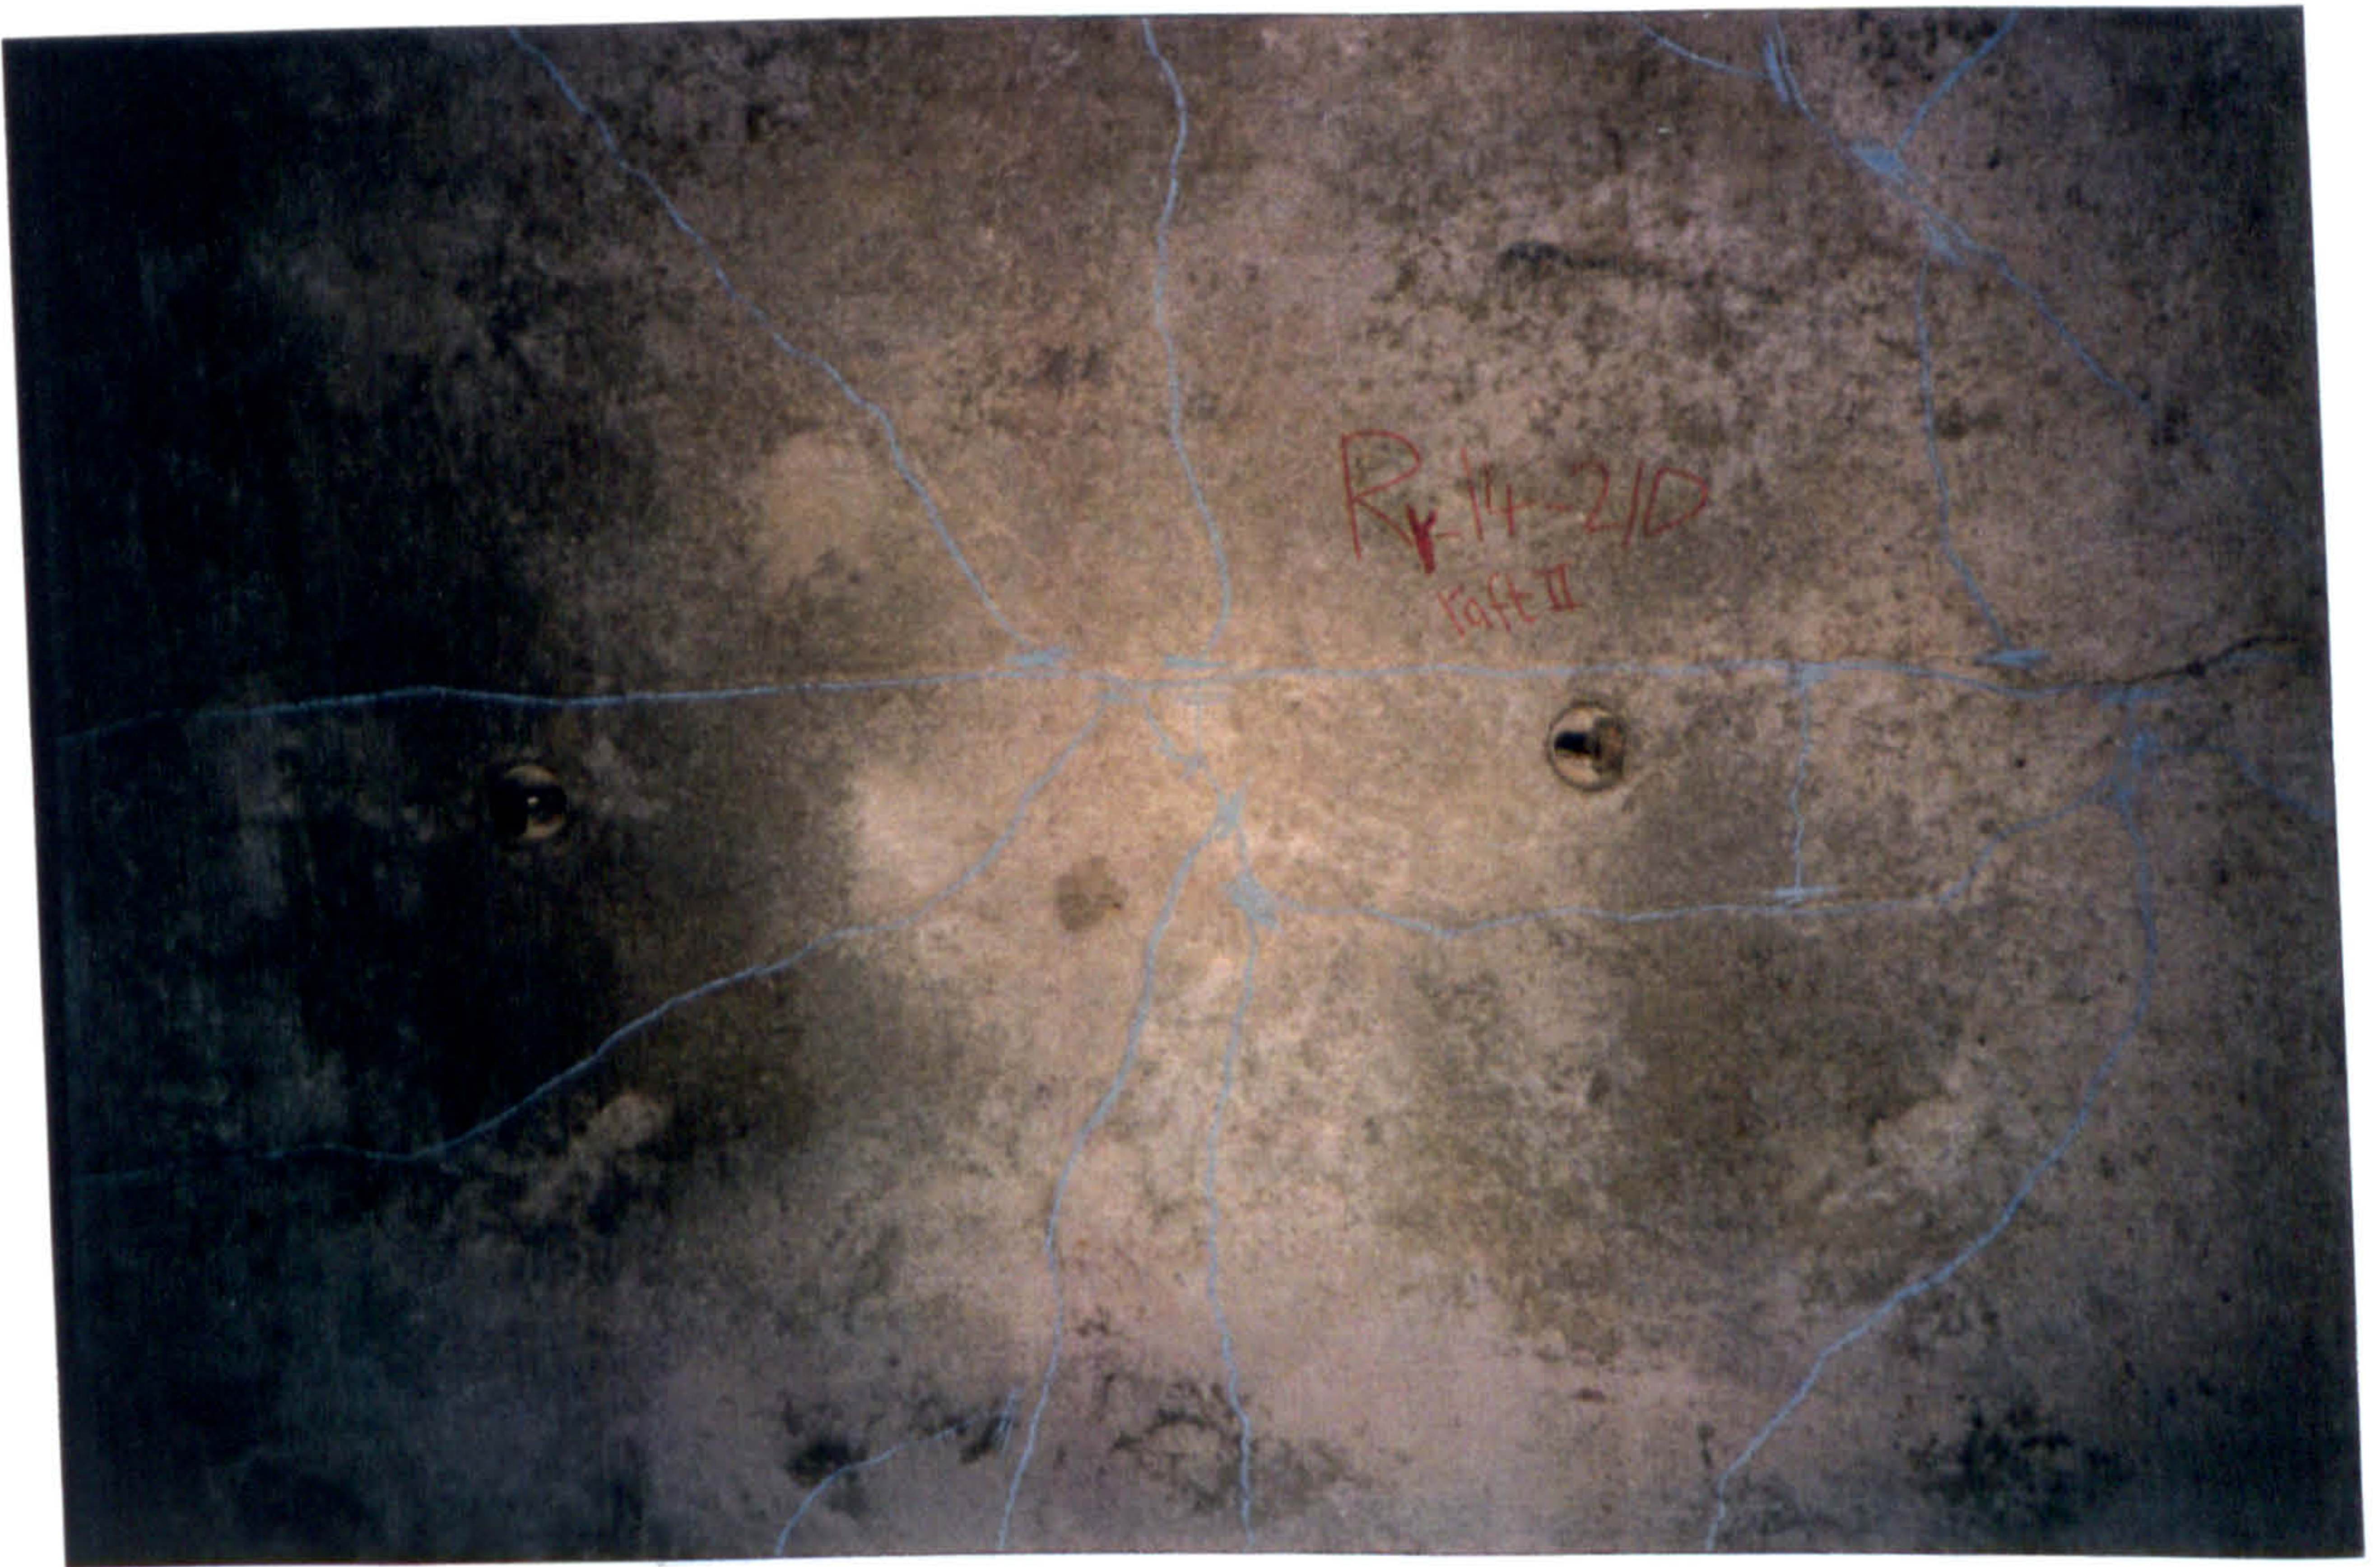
Bottom Crack Patterns at Failure of Raft RR - Module M1
